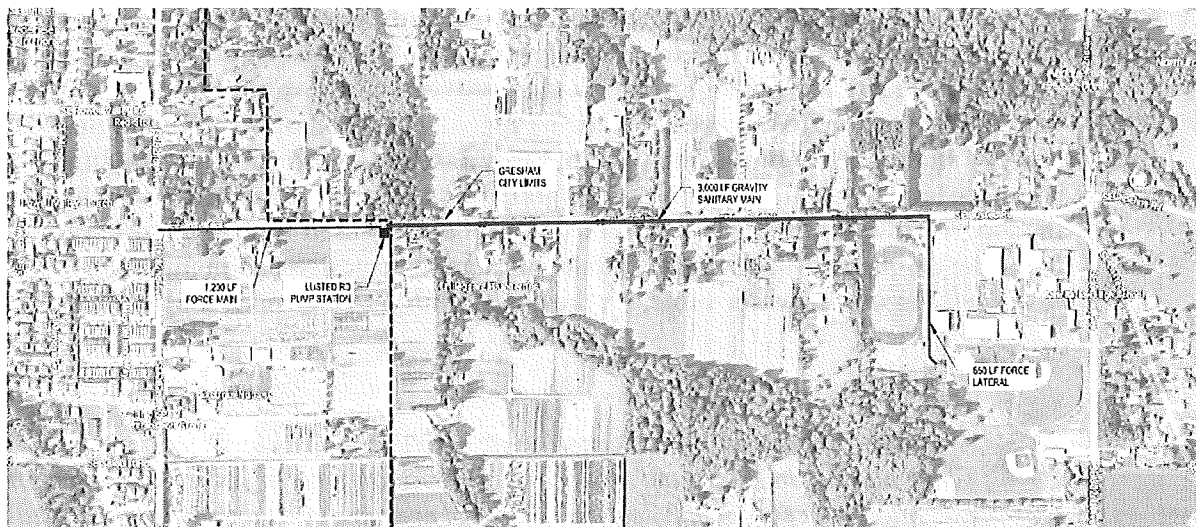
Detail from Gresham Wastewater Pump Station Master Plan
